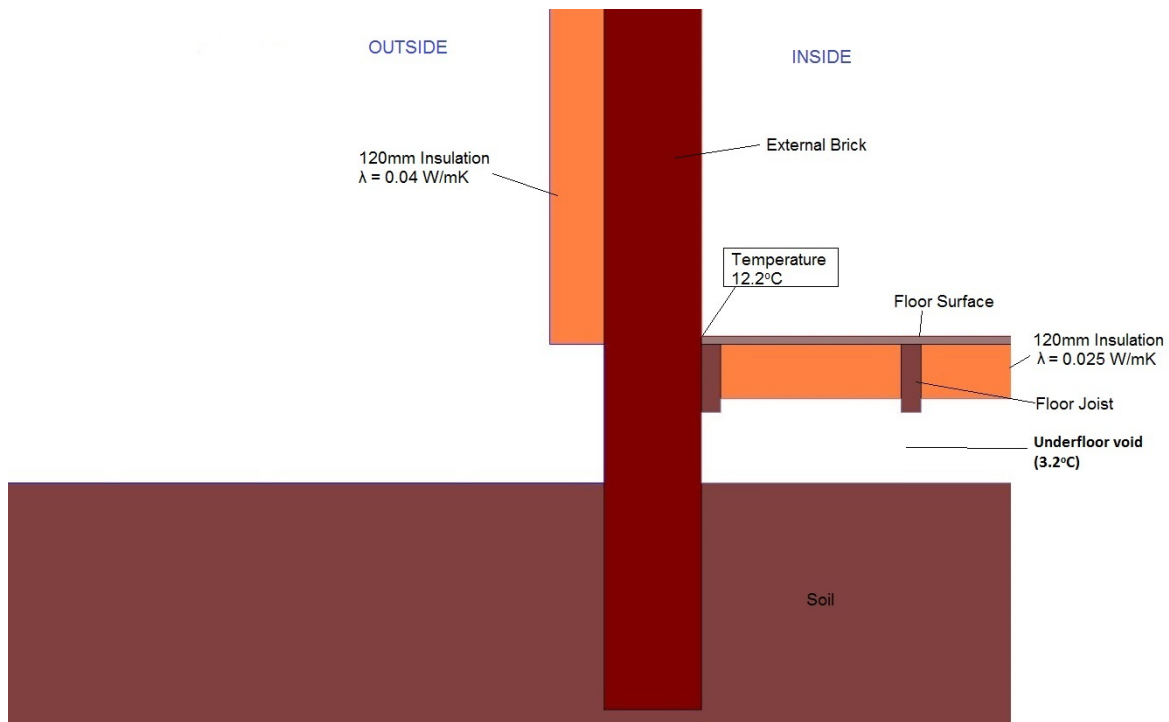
Junction between an insulated suspended ground floor (typology R1) and a wall with external insulation (typology R9) with no junction insulation
